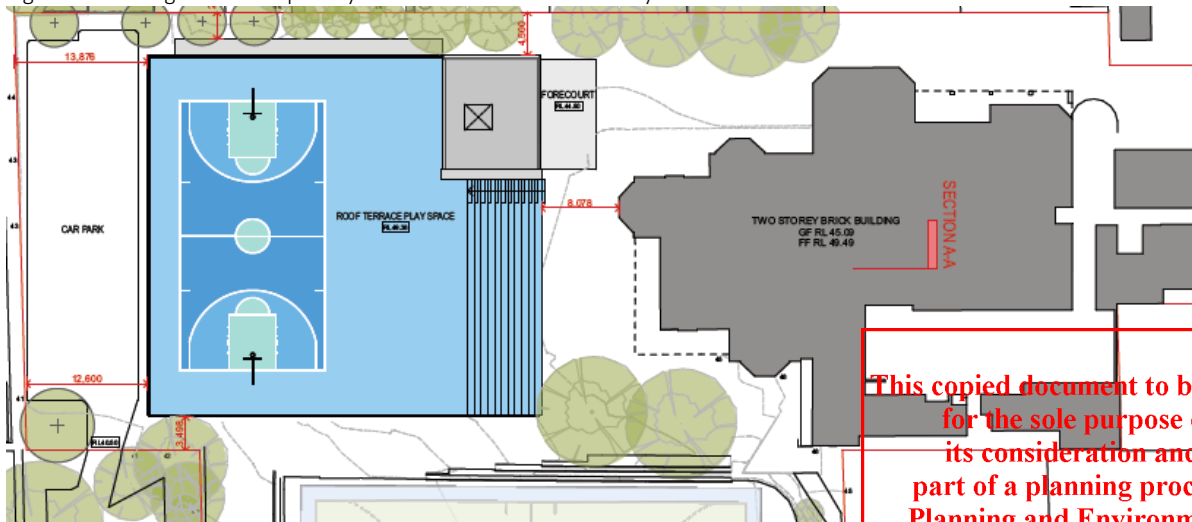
Proposed plan by Jackson Clements Burrows Pty Ltd Architects
